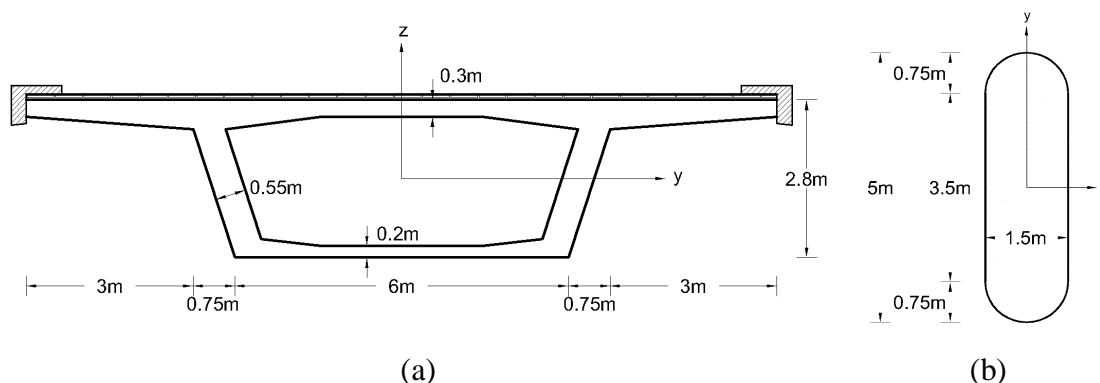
Cross-sections of: (a) deck and (b) bridge piers.
